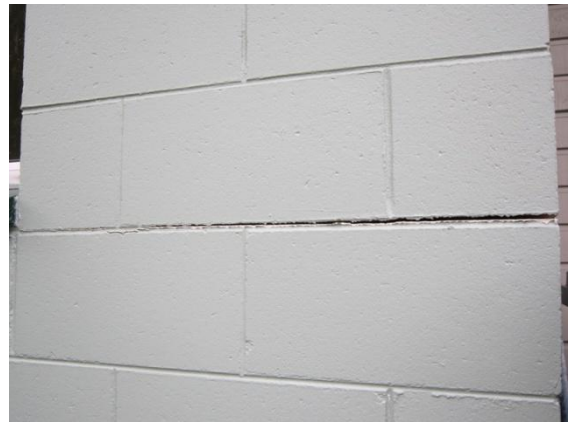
5mm horizontal gap opening up along masonry joint on 800mm long wall
